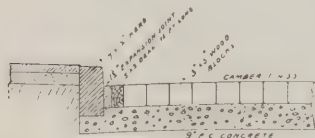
Wood-block Paved Road on Concrete Foundation.
